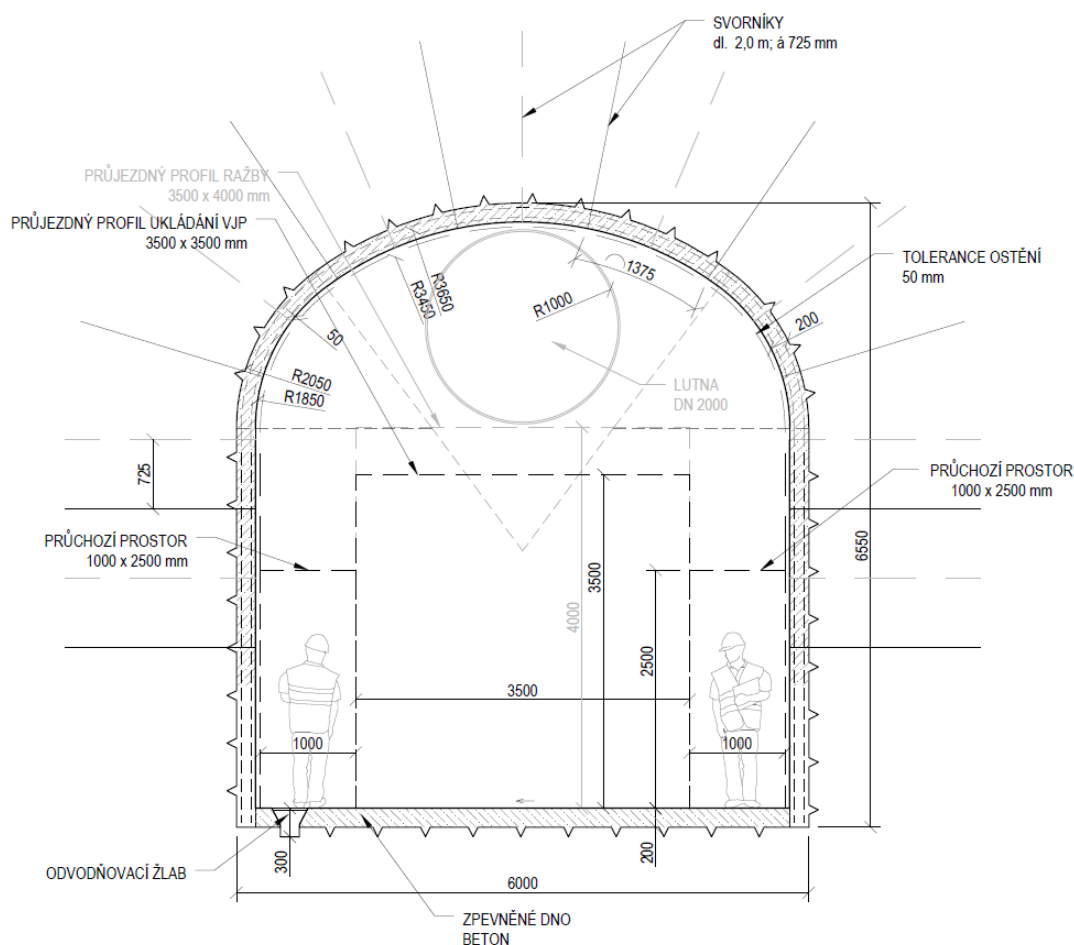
Cross-section of the loading/extraction tunnels (Butovič et al. 2020)
